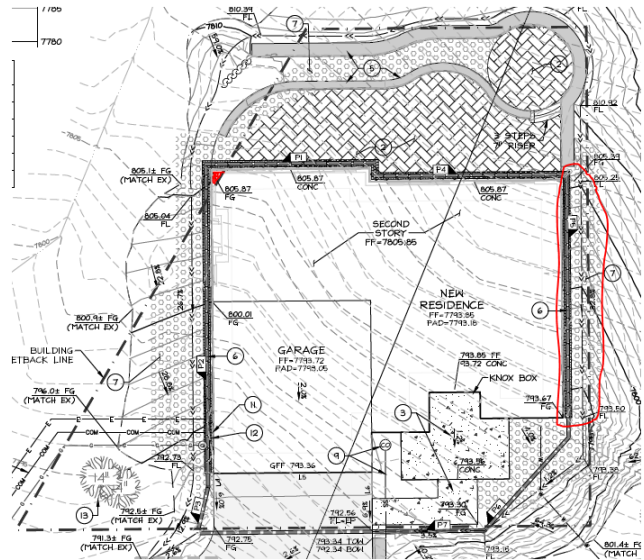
NW Encroachment Area & 5' setback from Building Envelope
